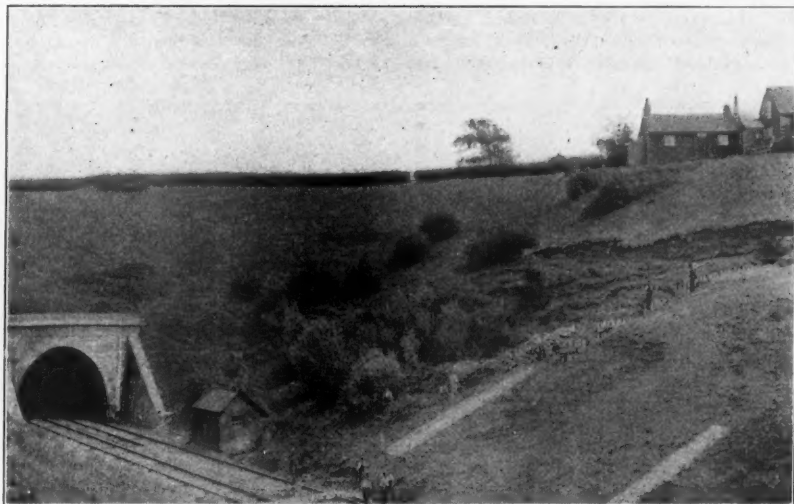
A Slip at End of Gillingham Tunnel, London & Southwestern.
